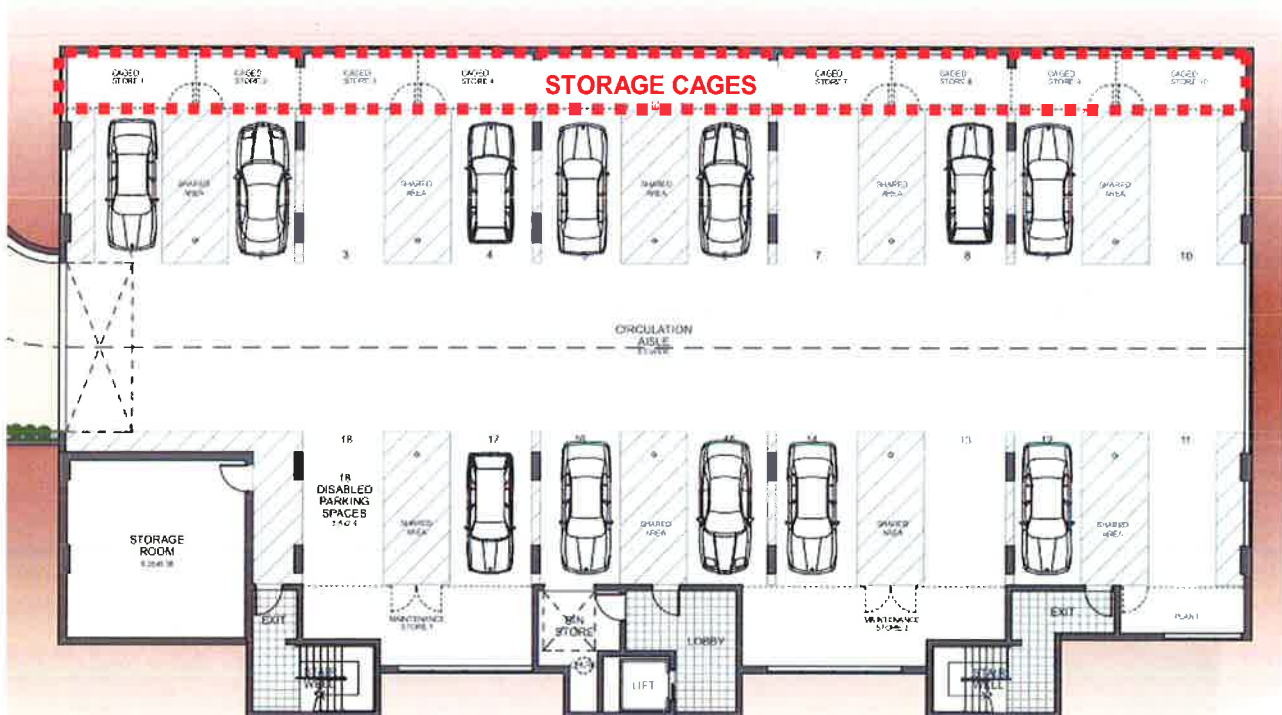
Typical Apartment Block Basement Level Floor Plan
